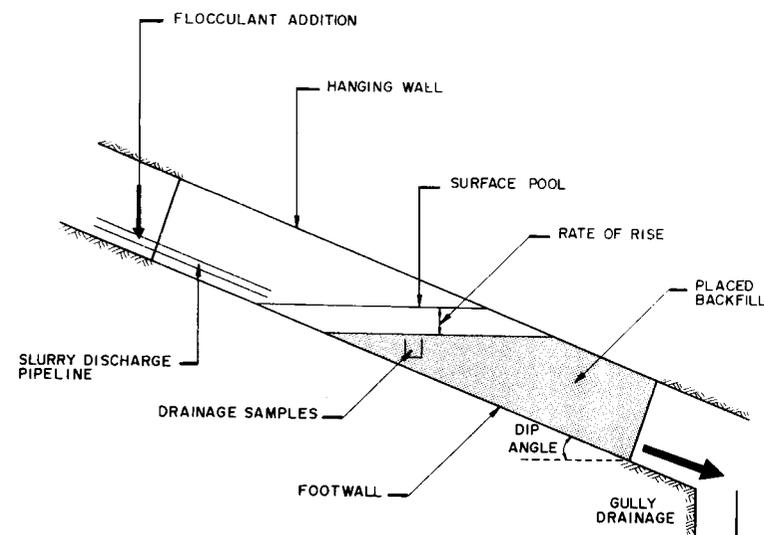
Typical underground testing arrangement for the testing of various backfill-geotextile combinations
